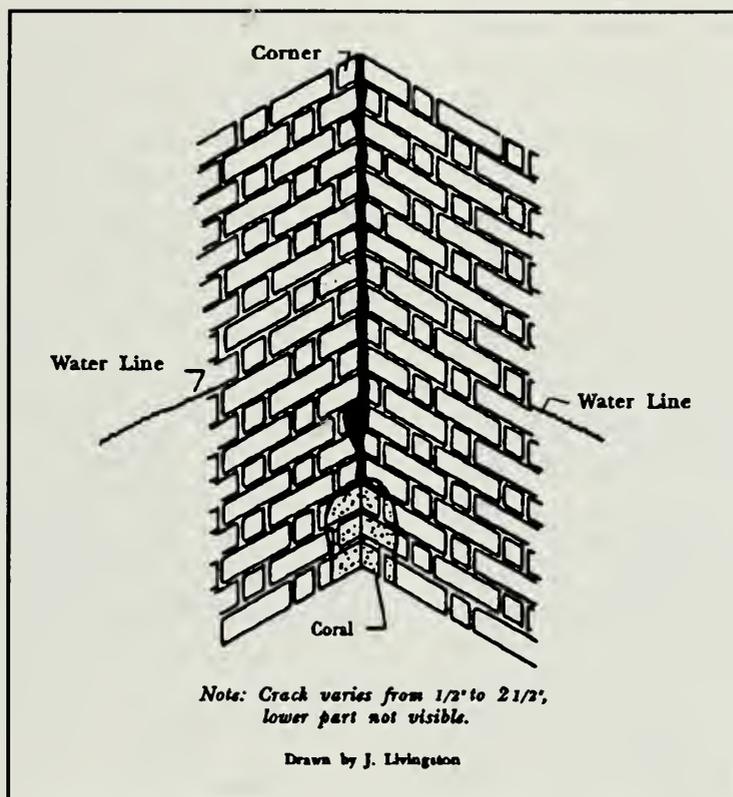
Example of 1971 wall crack survey drawings.
